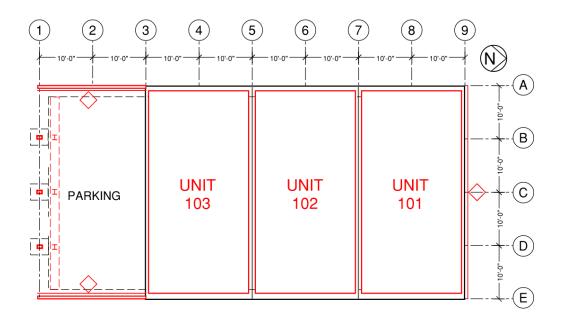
First-story plan showing steel cantilever column and grade beam retrofit location for the short-side-open building. I-shaped symbols depict new cantilever columns. Diamond symbols and associated lines depict new wood-structural-panel shear walls.
